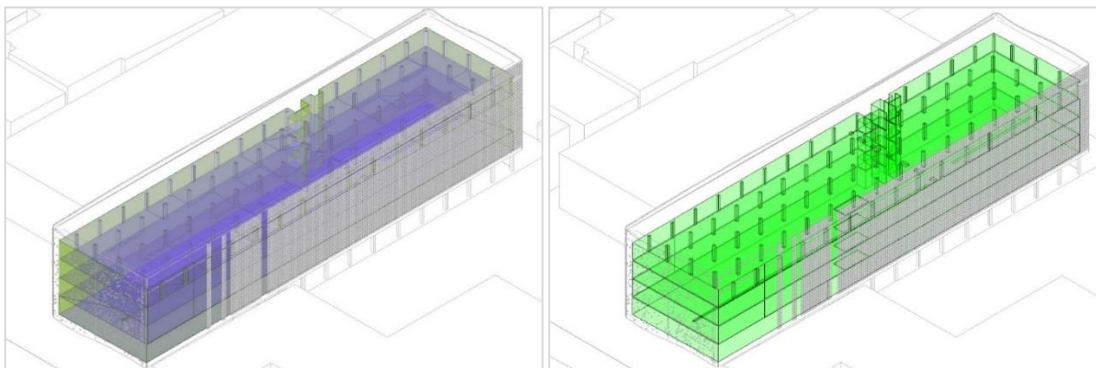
BIM Model of the Proposed Factory Building (Source: Author)
